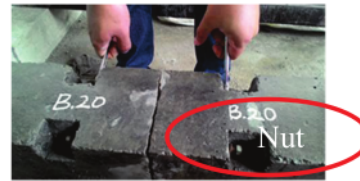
Fixing the nut on the connection of precast segmental concrete
